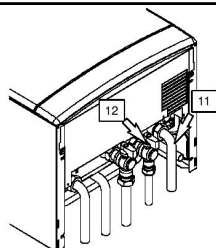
bottom view of boiler / widok dolnej części kotła
